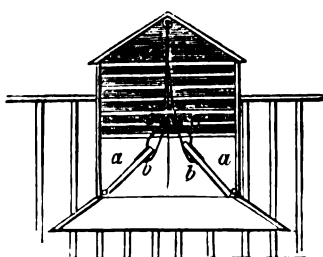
is simply a front elevation of a portion of a roof and wall of a byre or other building, having on its ridge an ordinary ventilator, with fixed luffer-boardings. Externally, there is no essential difference between the old and the improved construction. Fig. 2. is a vertical section in the longitudinal direction of the roof, and cutting down through its ridge. Here the shell of the ventilator is seated upon the roof in the usual way. Its interior dimensions may be about 3 feet by 2 feet, and 3 feet high. A continuation of the void of the ventilator is carried downward with light close boarding, forming a chamber, *aa*, in which the regulator operates; its interior dimensions being, as above stated, 3 by 2 feet, and about  $2\frac{1}{2}$  feet deep below the apex of the roof. At bottom the chamber spreads out on all the four sides, taking the form of an inverted funnel, the better to receive the upward current of heated or vitiated air from below. Immediately at the bottom of the chamber, and where it begins to spread out downward, the two valves, or doors of light deal, are
